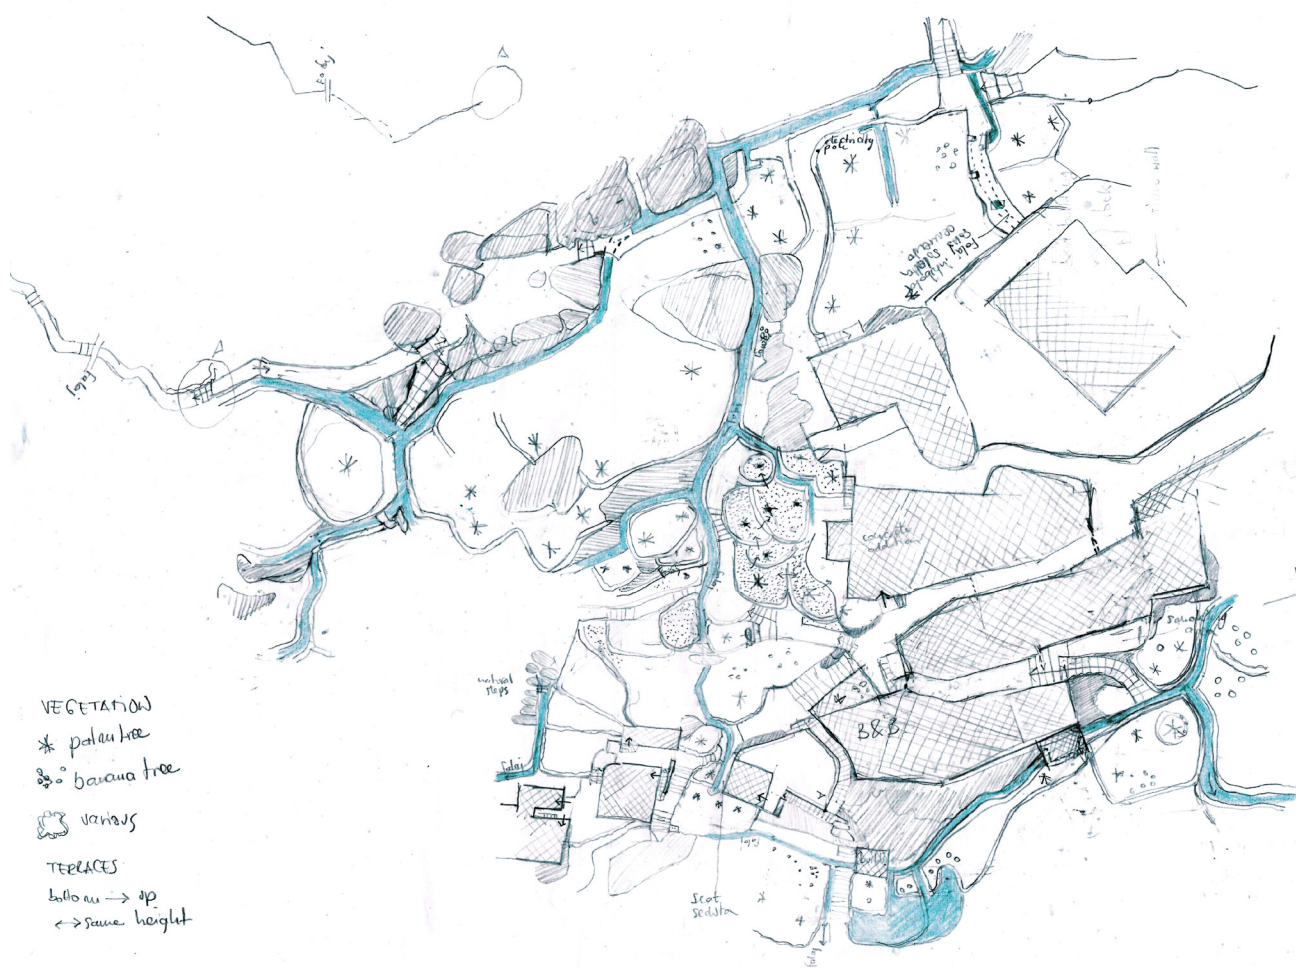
(above): field sketches showing measured streets and buildings, and construction details
